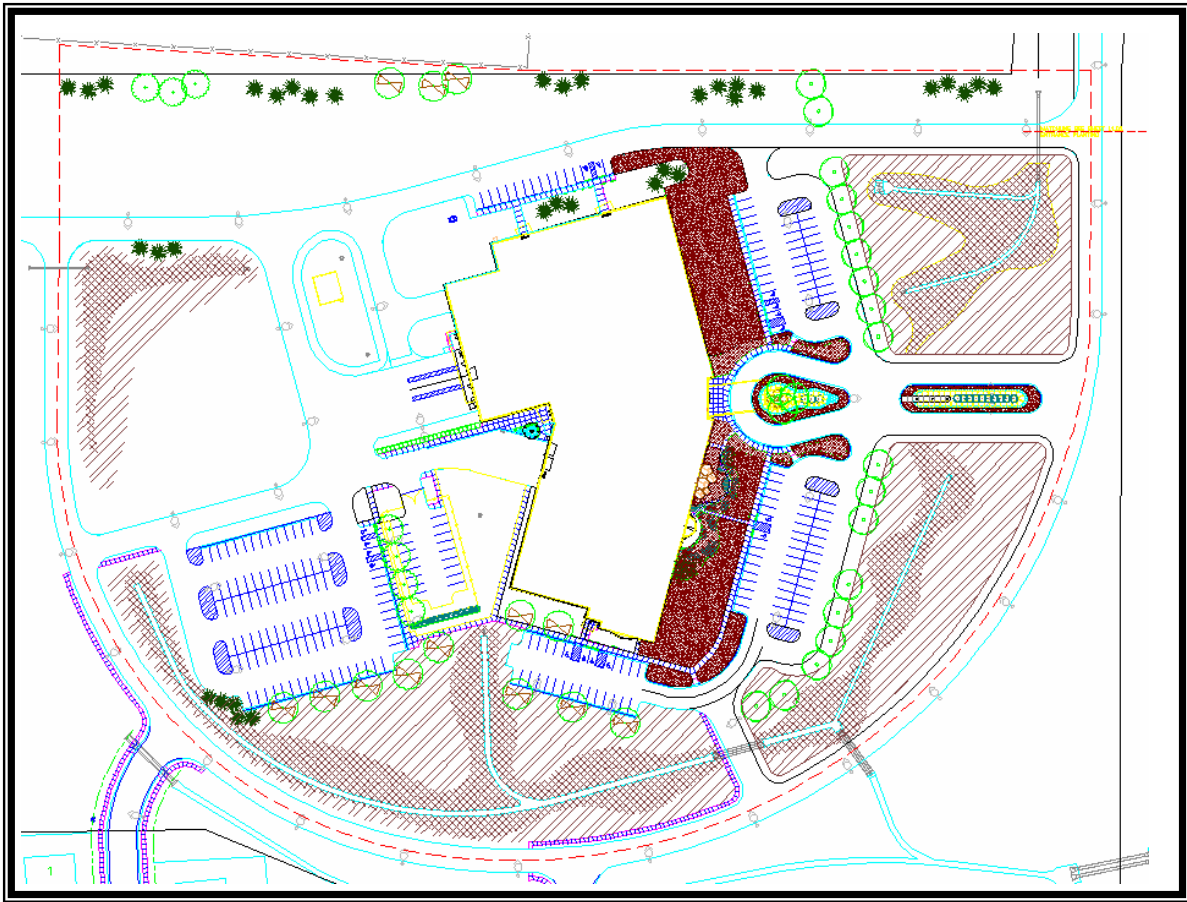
Site Plan for the Sisseton Ambulatory Care Facility
